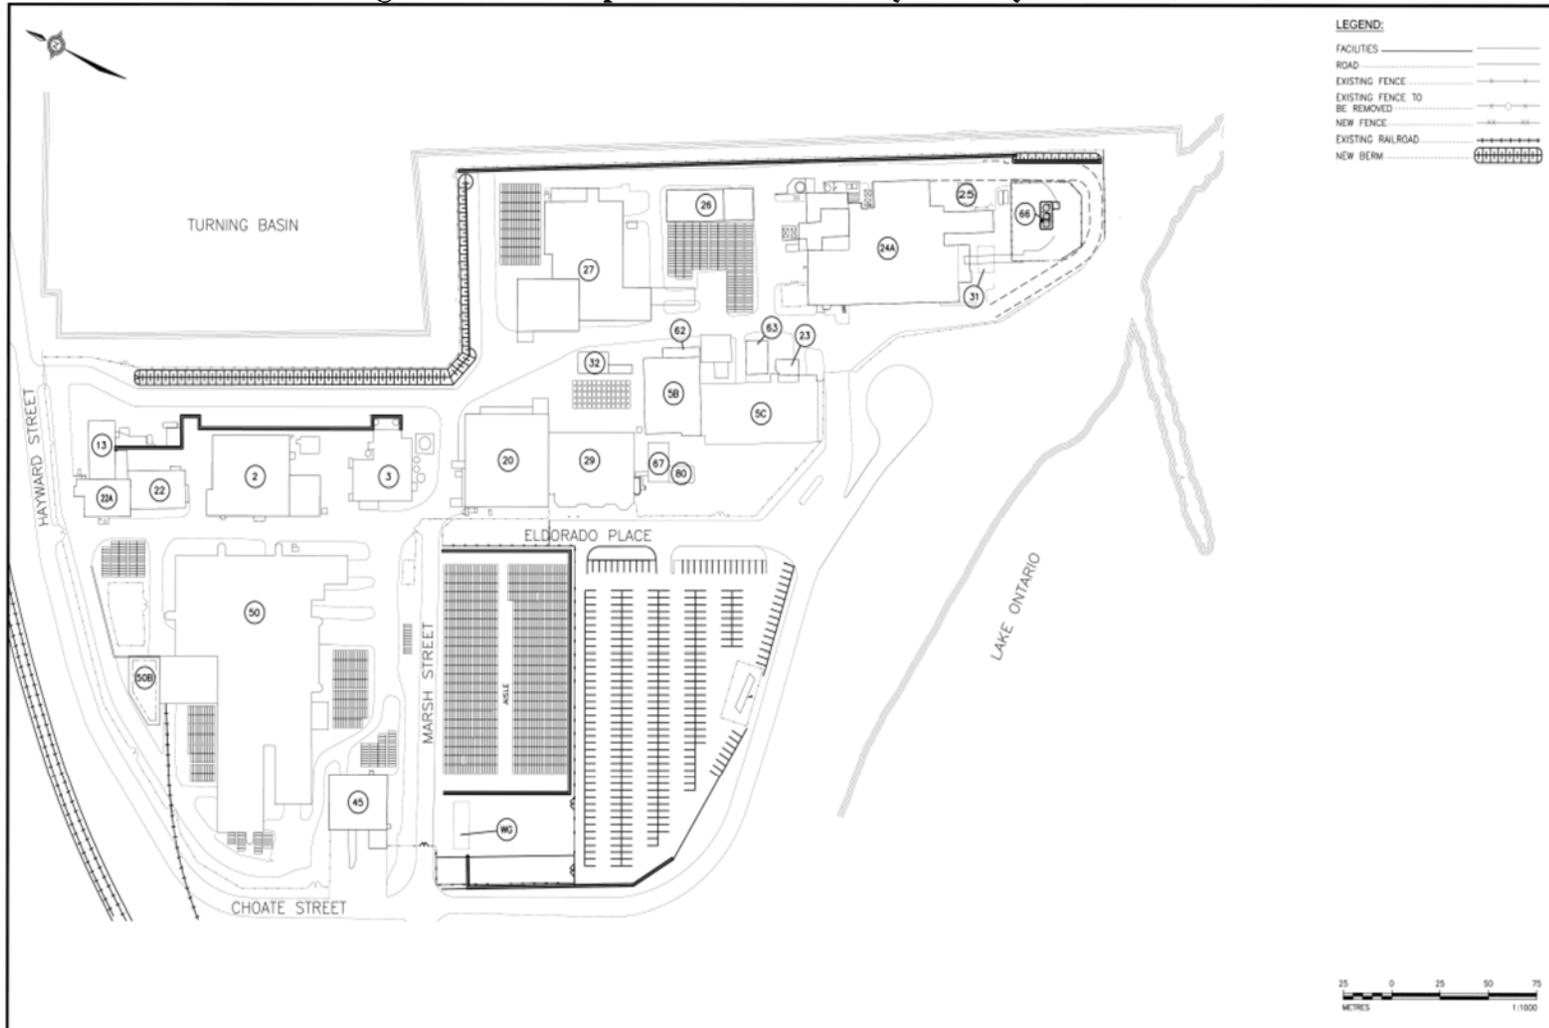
Port Hope Conversion Facility Site Layout Post VIM
